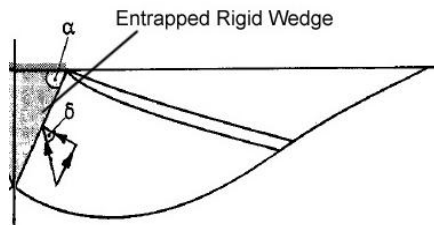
Failure mechanisms for a rough base foundations assumed by Bolton and Lau (1993) [5].
